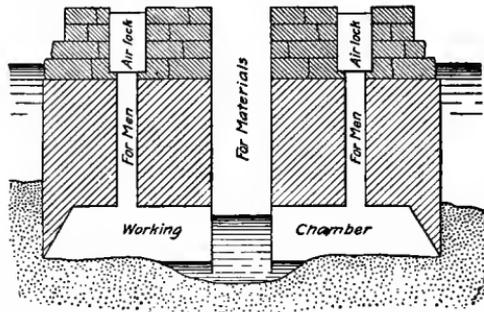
WATER-COLUMN. BROOKLYN BRIDGE.
